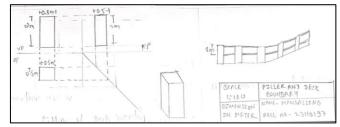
view of Deck Boundary with dimension drawn draw by Mangalsing Thakar
